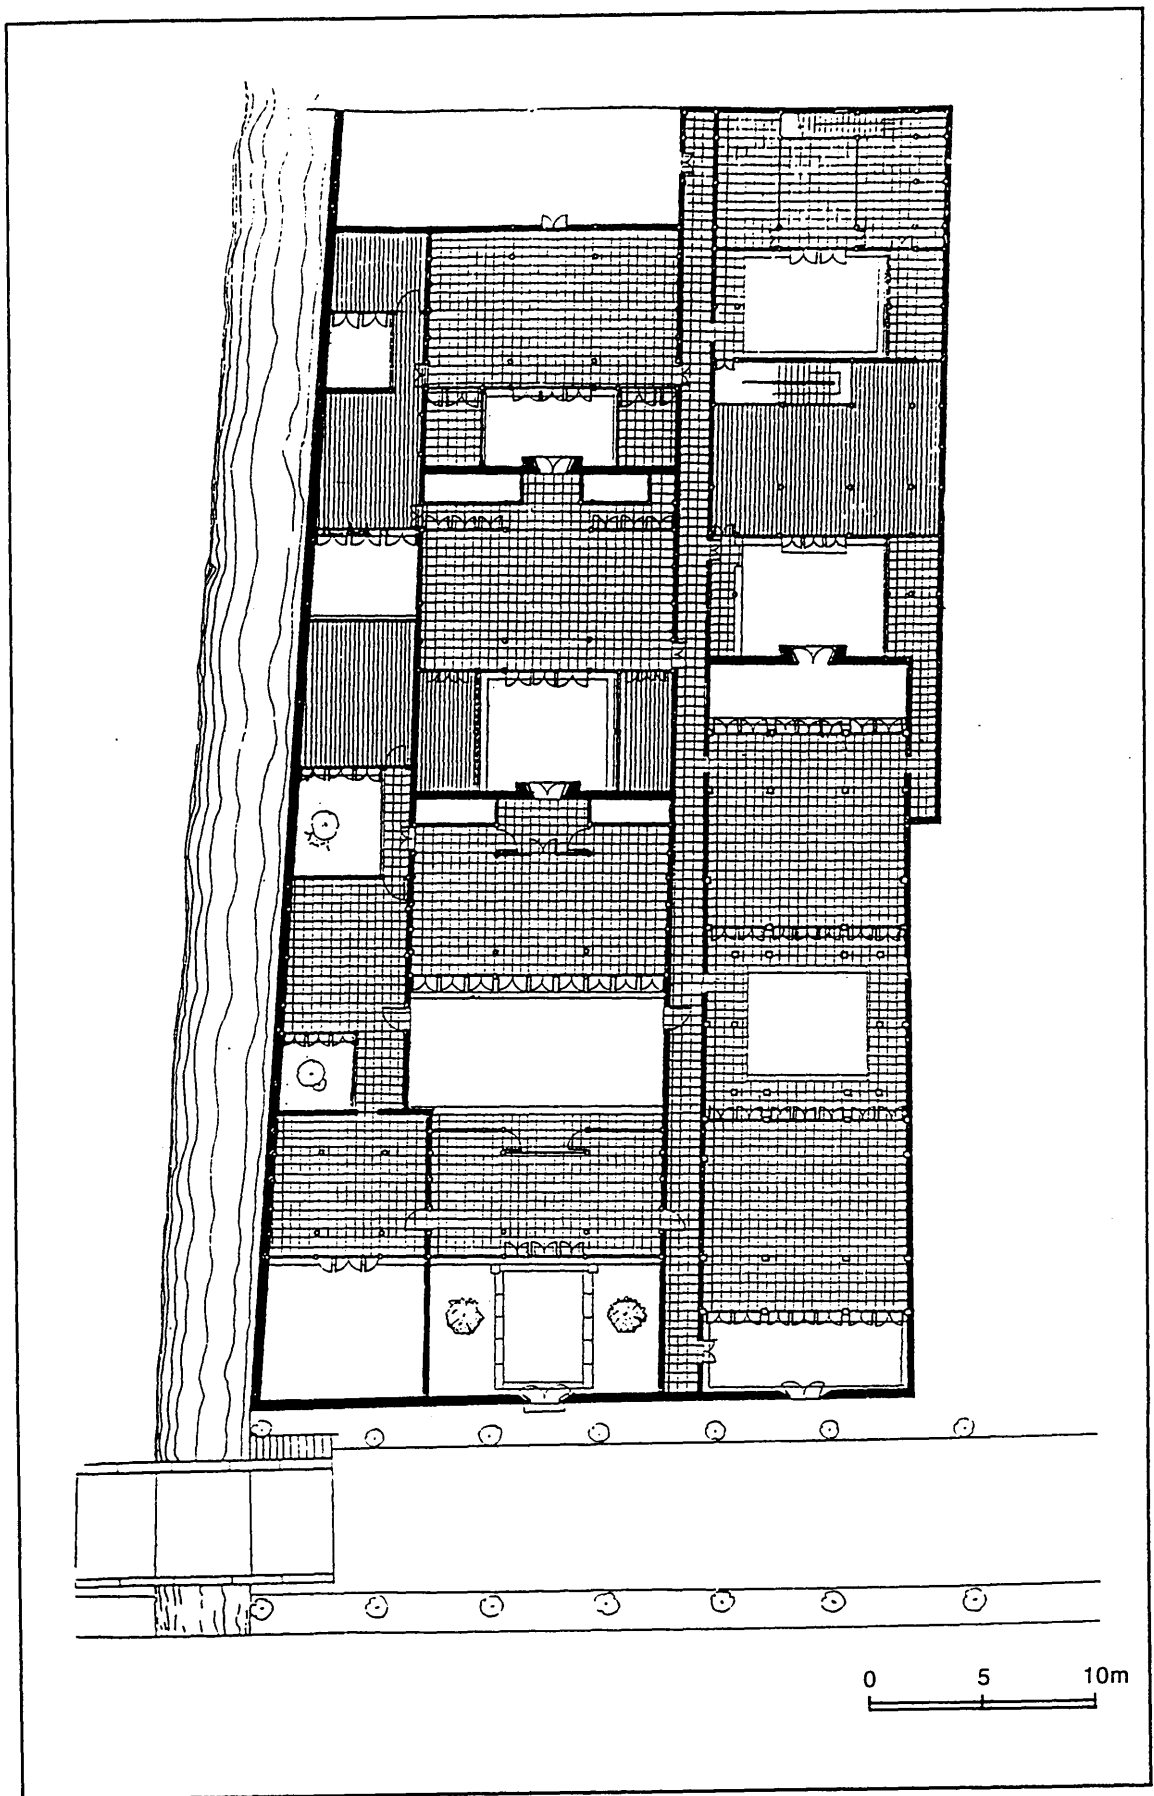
Plan of the house of the Chen 陳 family in Dongbei 東北 Street.
